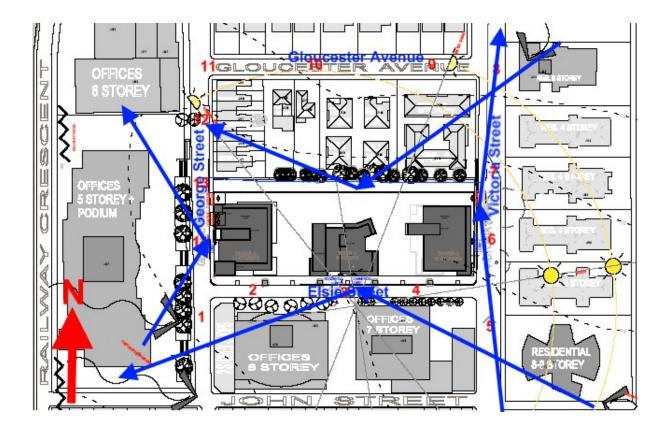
Overall Site Plan of the Development and Surrounding Road Carriageways
